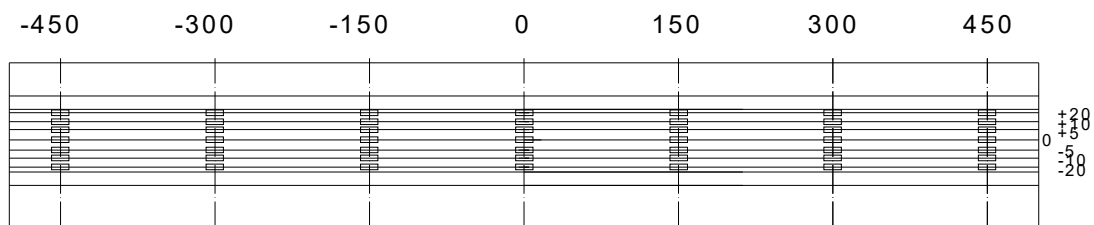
Measurement and cross-section placement on the top surface of the rail head I60.
